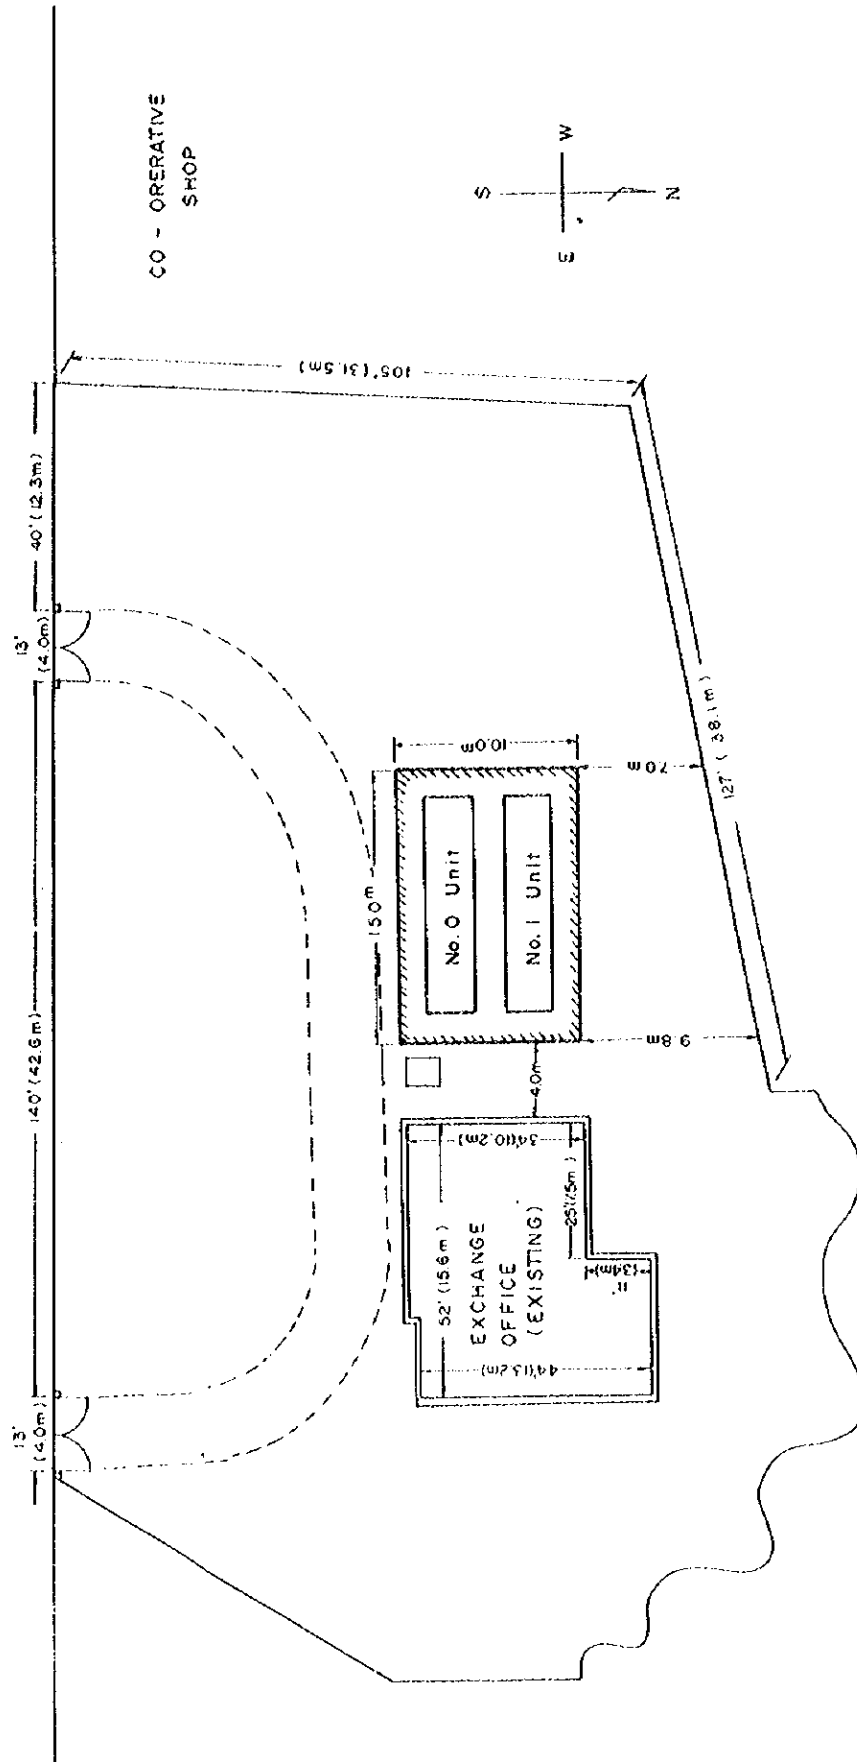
Site Plan for C2 Type Automatic Exchange in Mayangon
